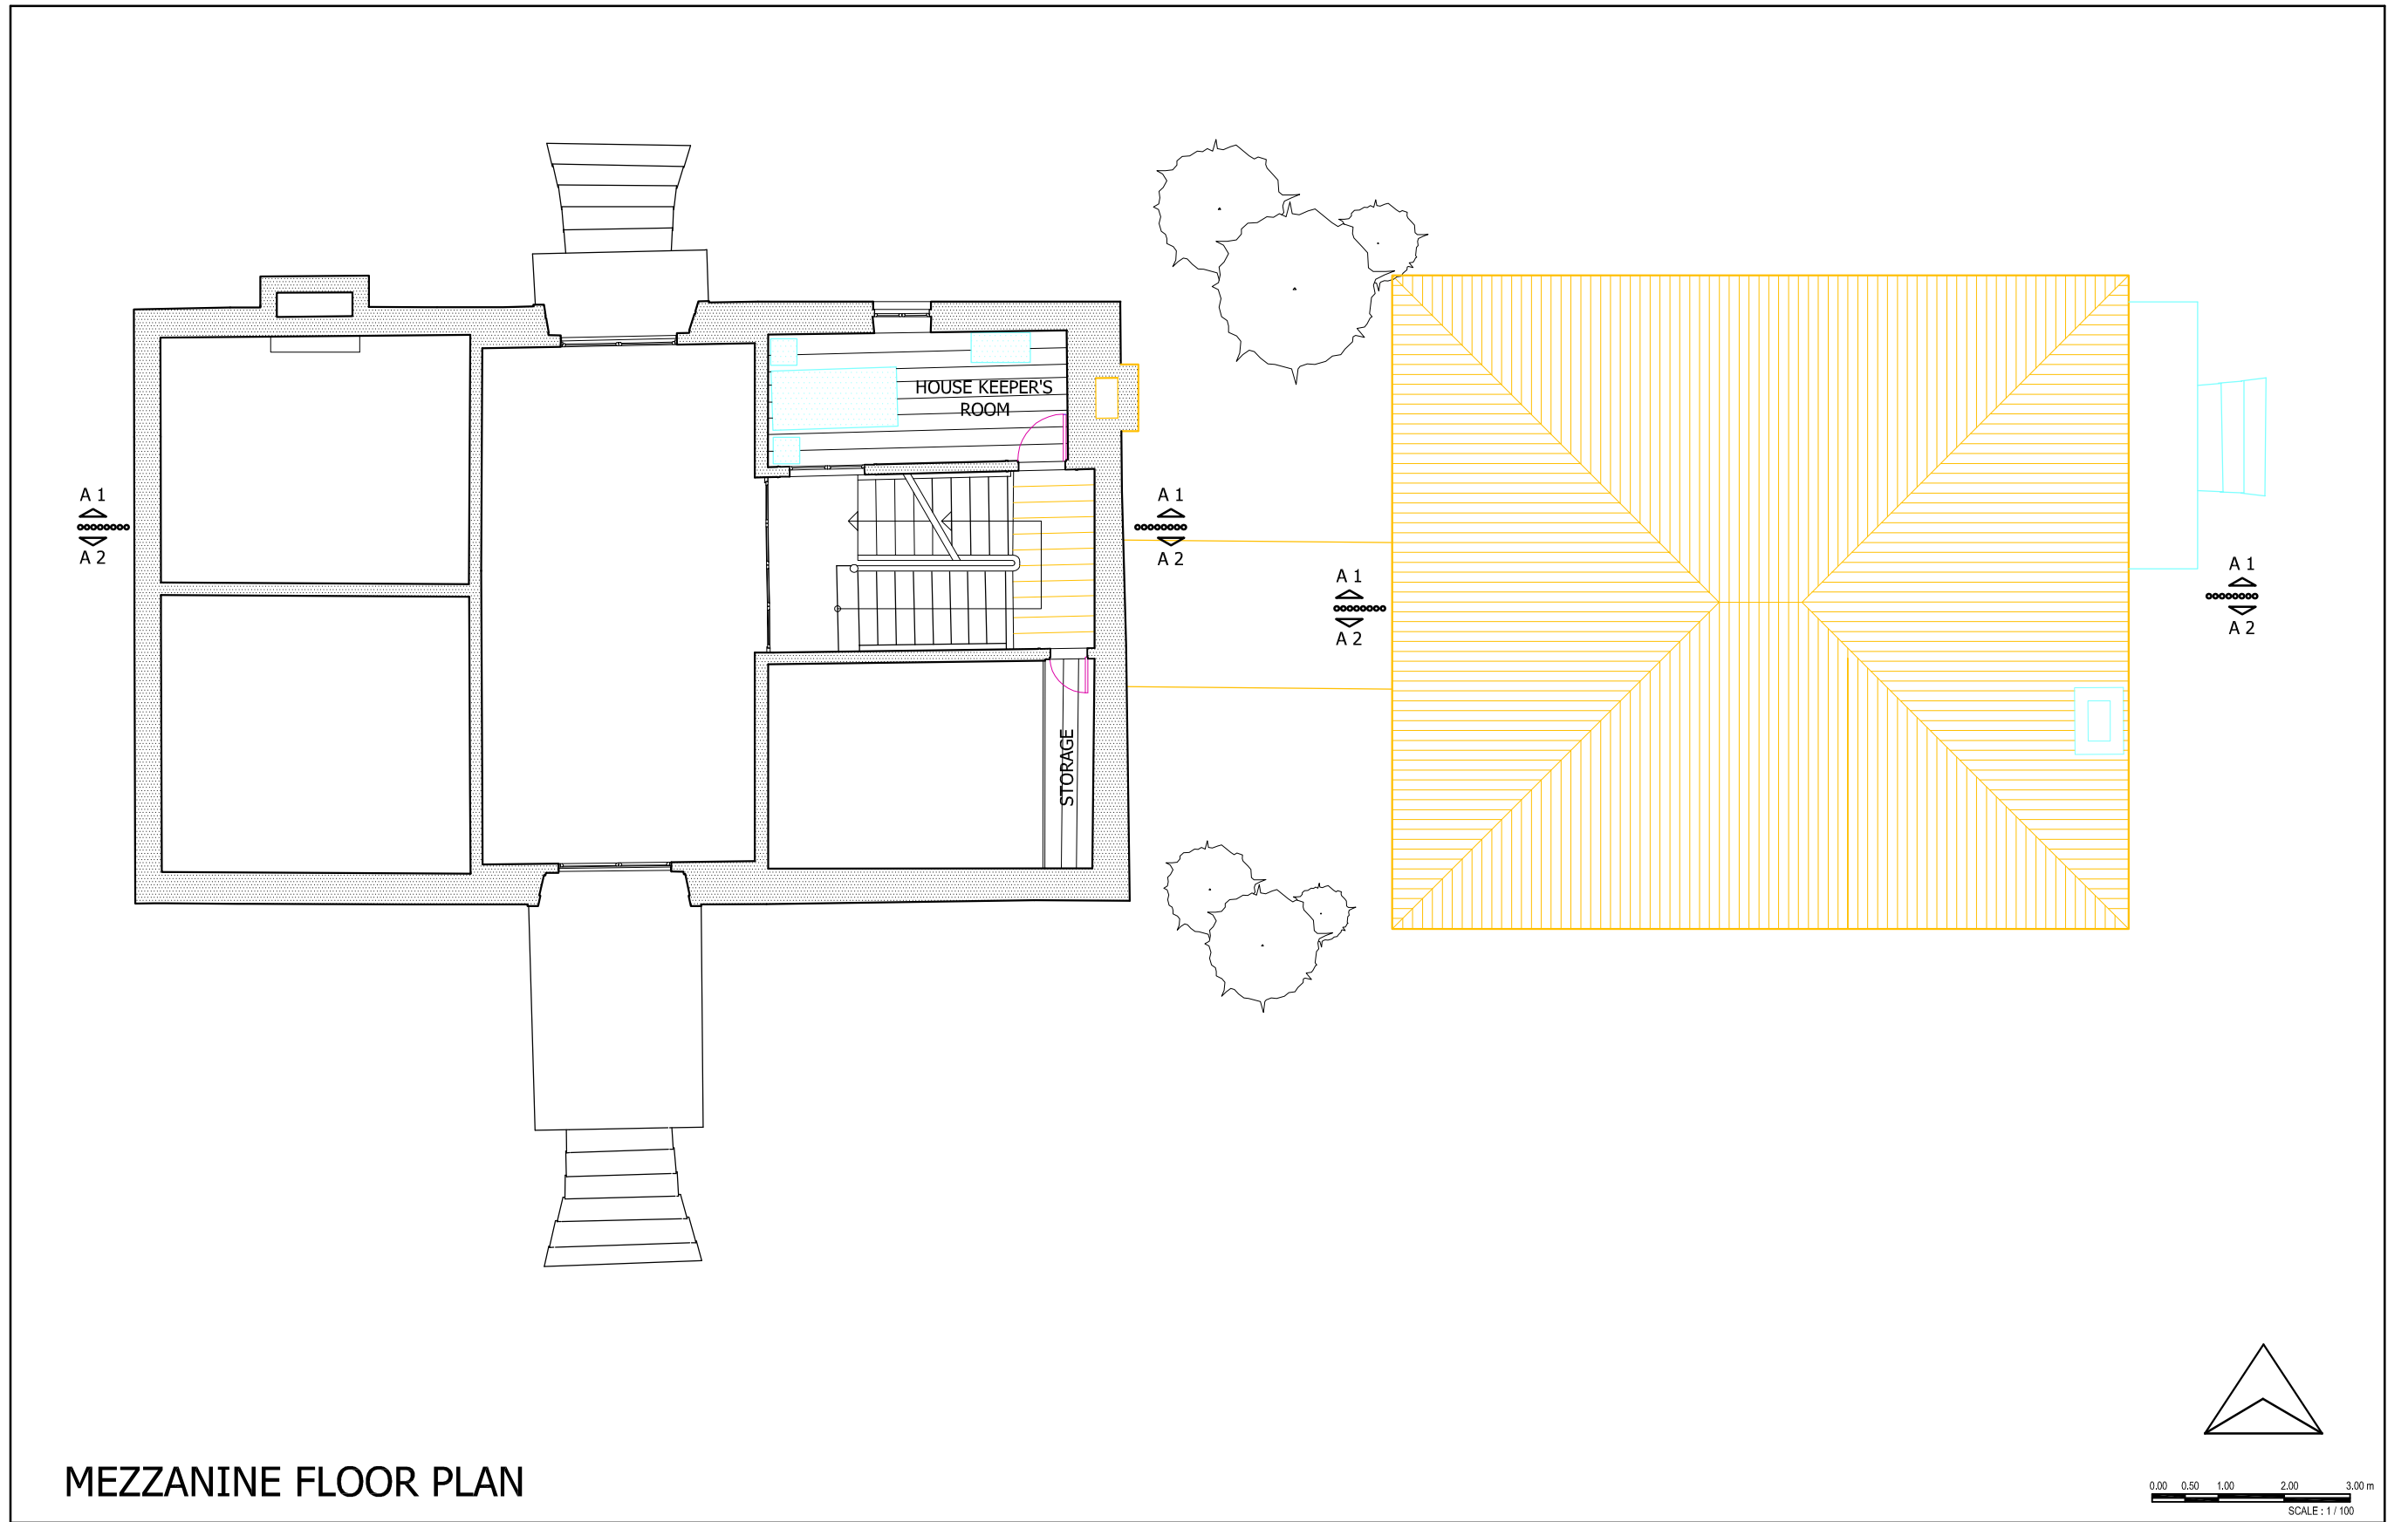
Reliability of Sources- Mezzanine Floor Plan
